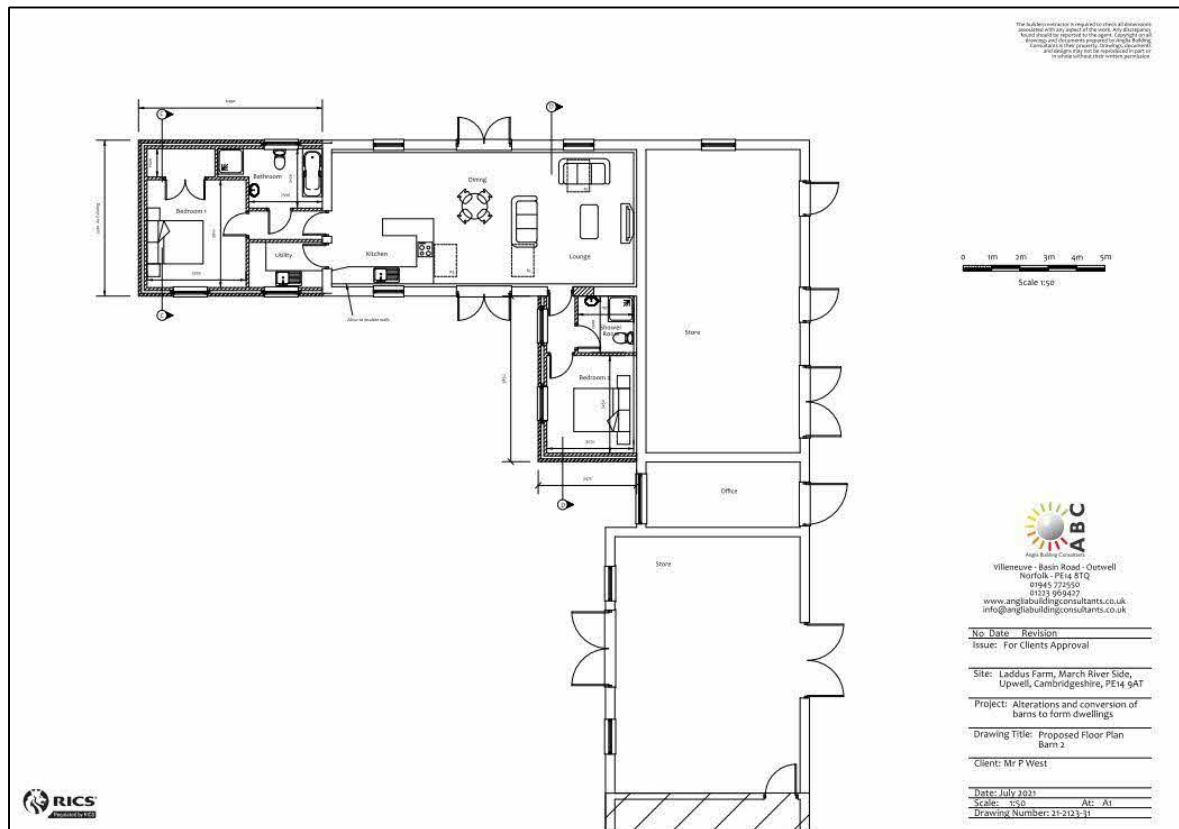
Proposed Floor Plan for Barn in North-West (Barn 2)
